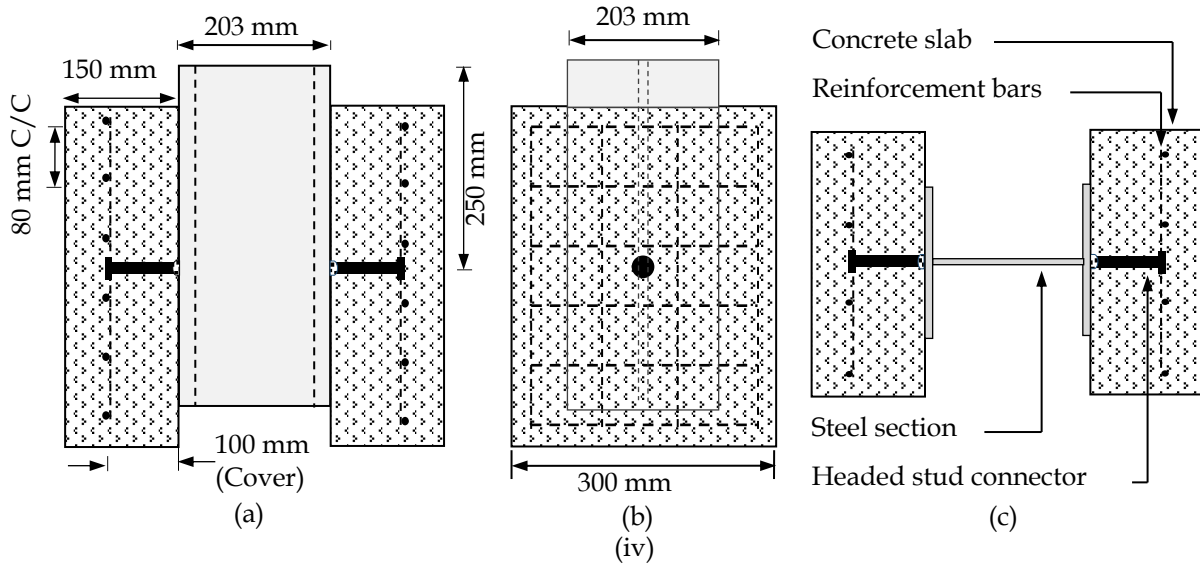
Steel-concrete composite specimen with single reinforcement layer; (i) at 25 mm, (ii) 50 mm, (iii) 75 mm and (iv) 100 mm, from root of stud; (a) front view, (b) side view and (c) top view
